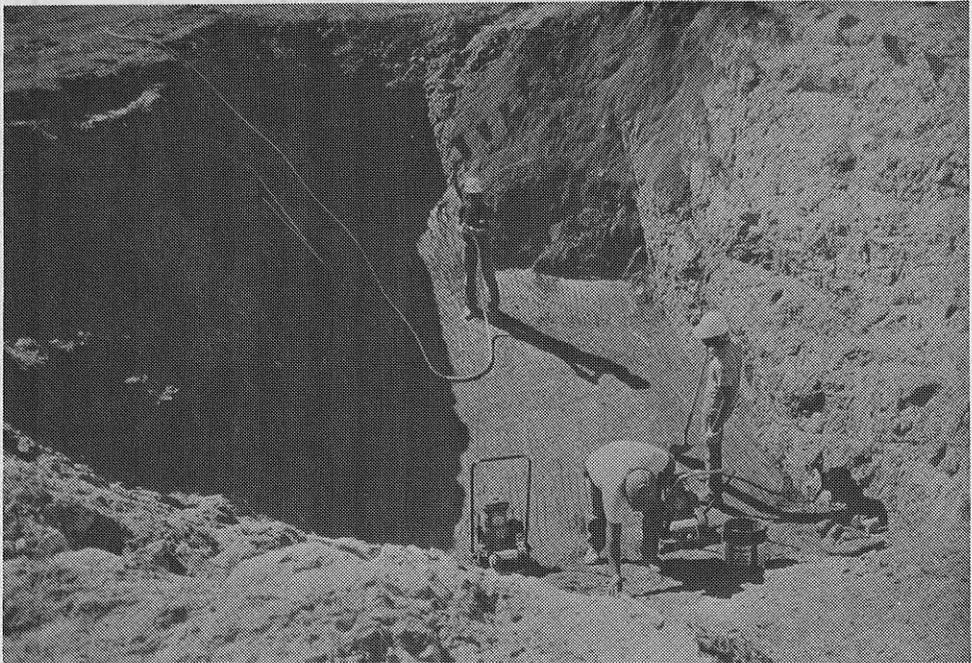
Backfilling foundation depression upstream of dam centerline between stations 14+85 and 15+25. February 1984
